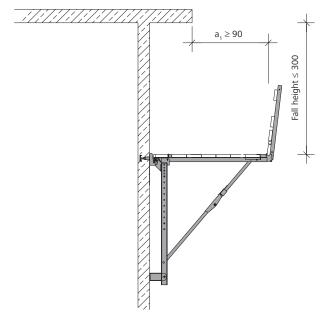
Use as a safety scaffold beneath an overhanging slab
